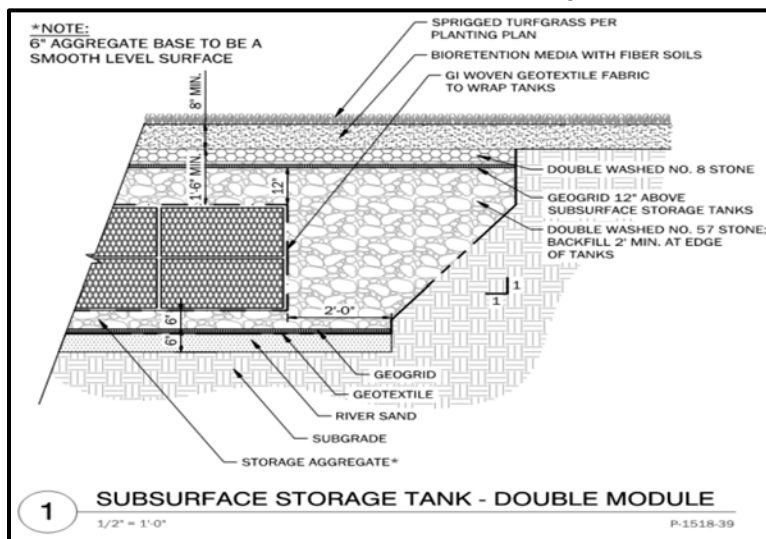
Typical Cross Section of Proposed Subsurface Storage Tank at Taylor Park
